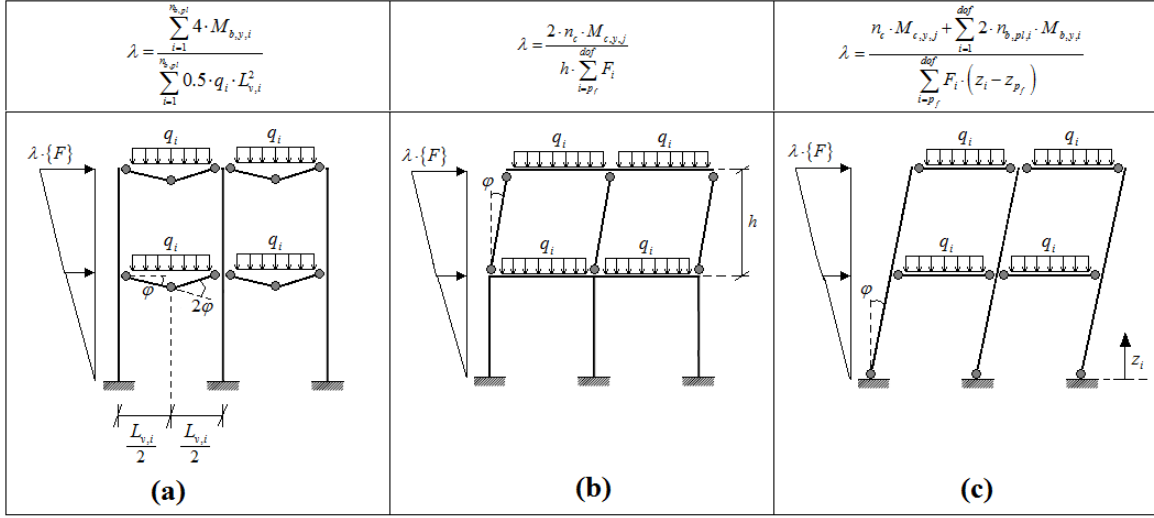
Beam (a) floor (b) and multistory (c) collapse mechanism and associated collapse multiplier of a RC building
